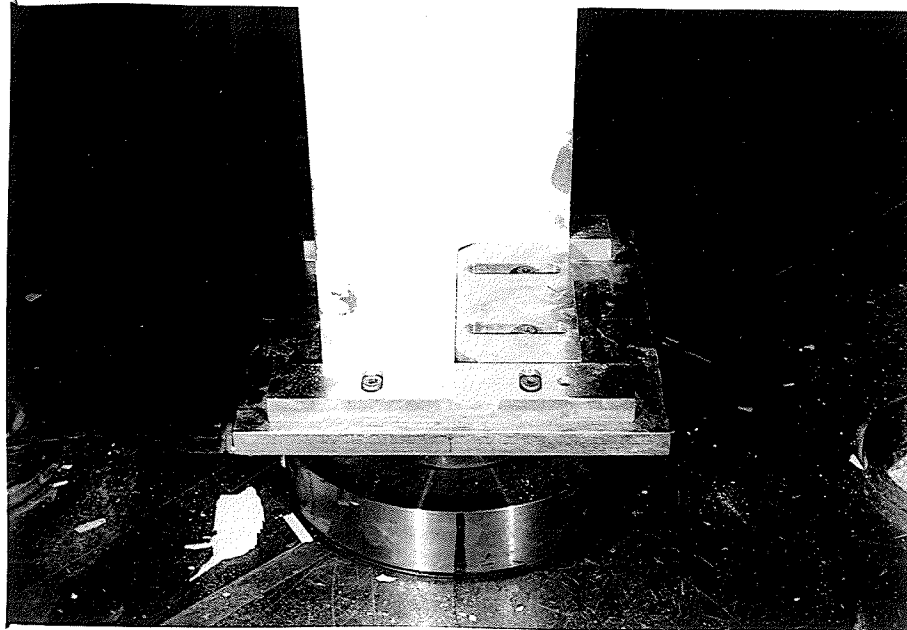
The End Plate with 18 inch Long Specimen in Place
